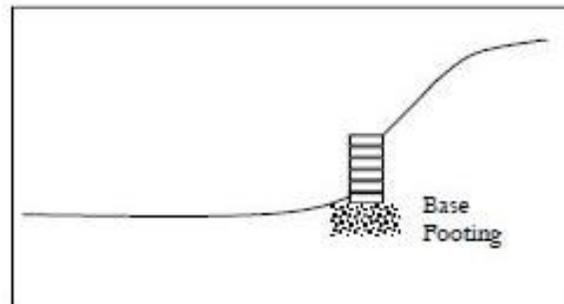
B. Mortared walls require significant footings below grade to maintain vertical position. Additional support provided by anchoring into slope for increased height and use in unstable soils.
